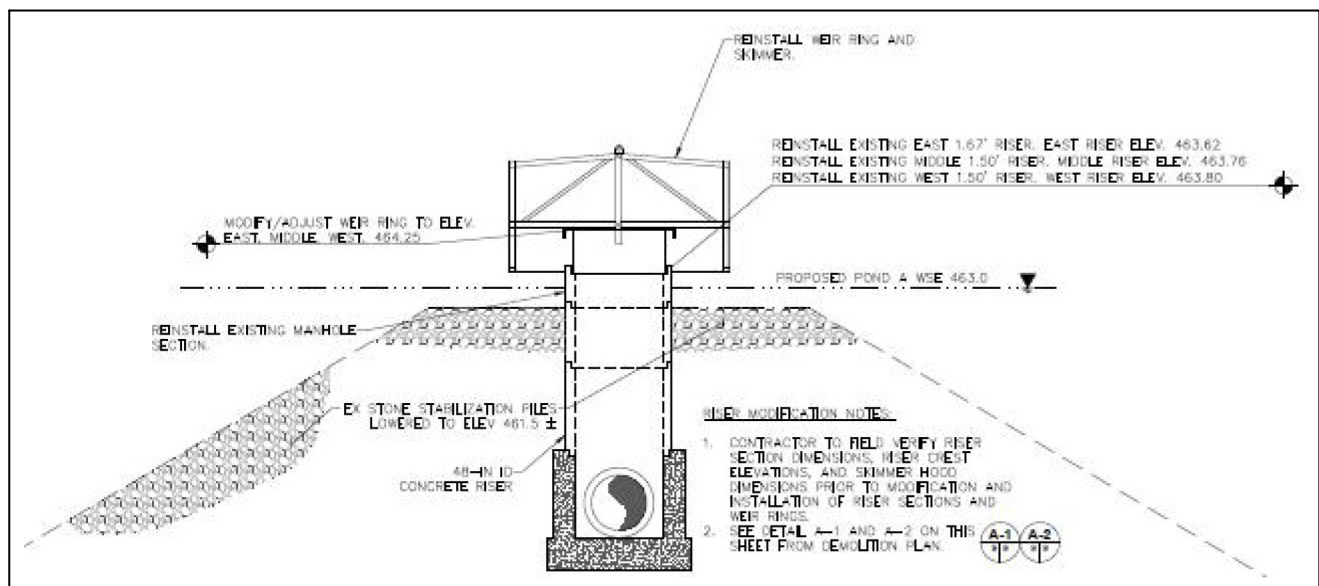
Modified Pond A Spillway Risers from 10W510-9
